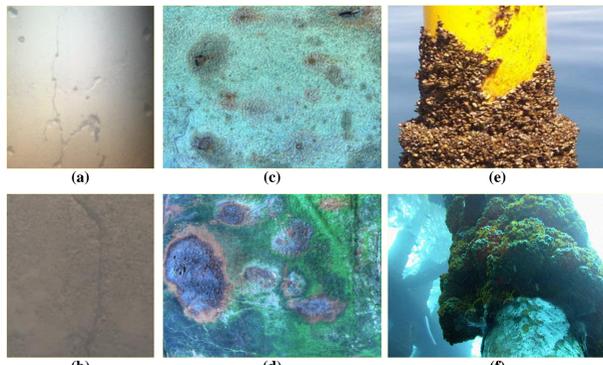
Examples of damage: (a-b) Cracks, (c-d) 2D Surface Damage, (e-f) 3D Damage
